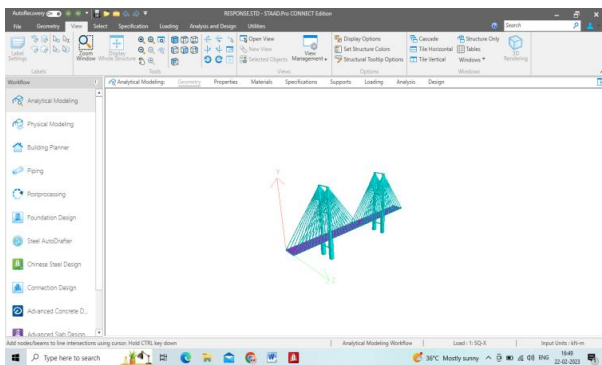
Displaying a cable- bridge in 3D rendered form.
